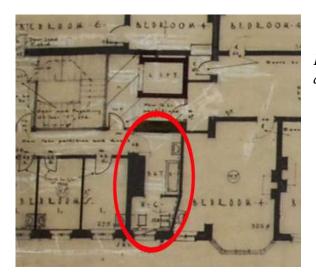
1953 Plan with room F23 and the sub-dividing wall.
